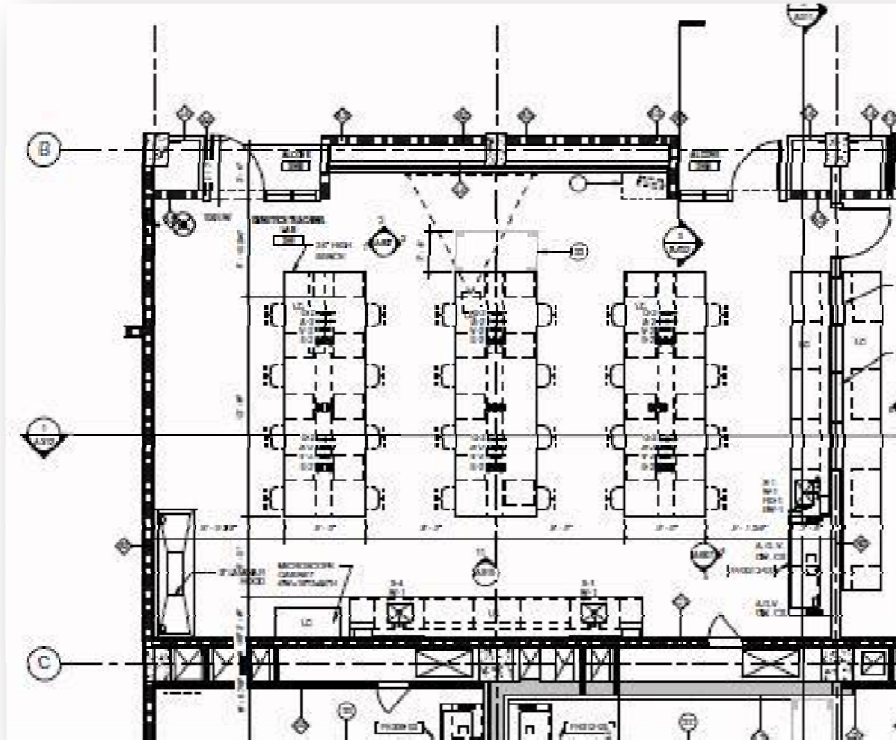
GENETICS TEACHING LAB FLOOR PLAN
